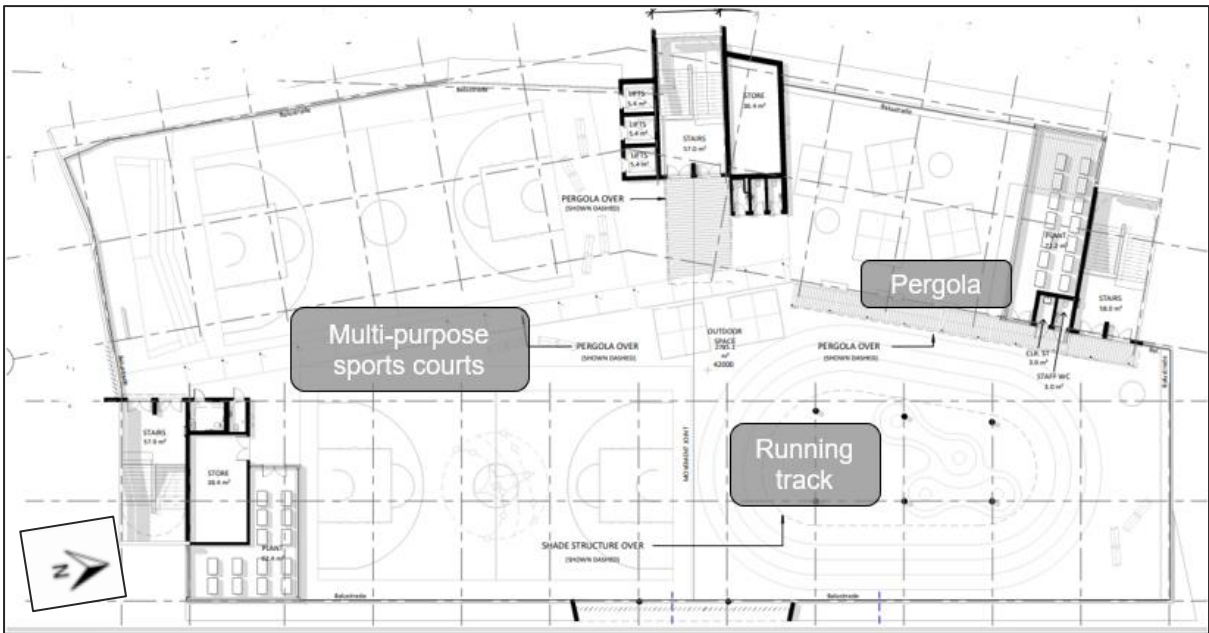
| Primary school – Level 5 rooftop floor plan (Source: Applicant's SRIS 2021)
